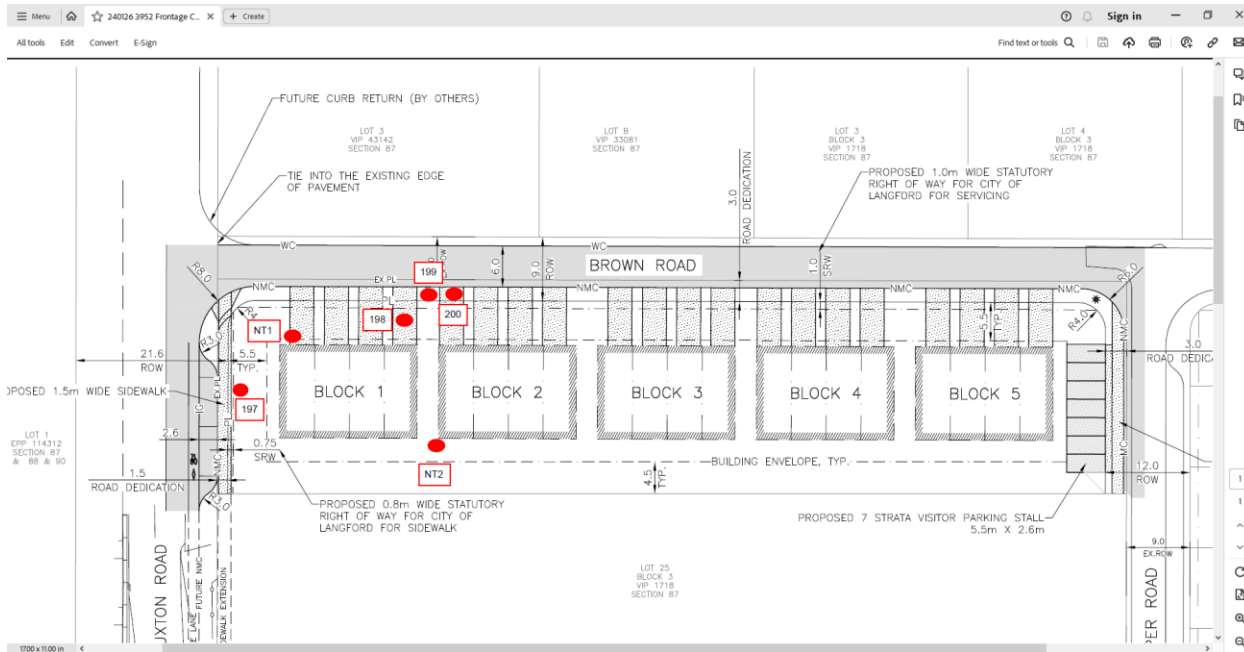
Site Map & Tree Locations Expanded – 3321 Luxton Road – Langford B.C.
